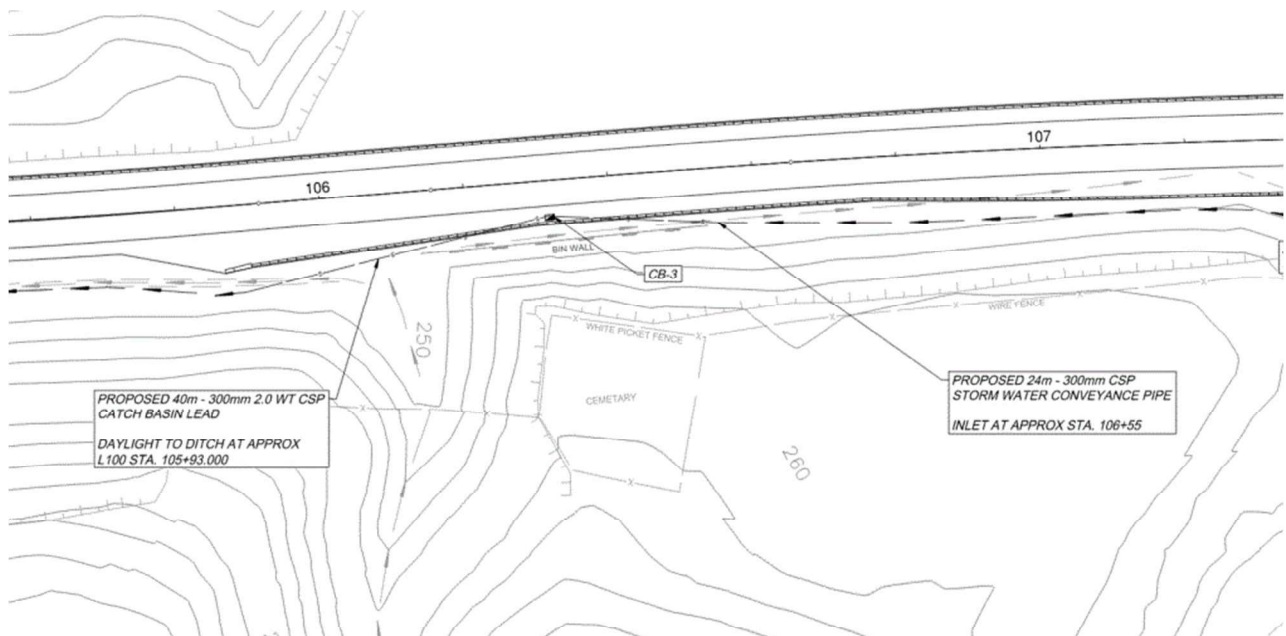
300 mm Conveyance Pipe to convey storm drainage adjacent to existing bin wall
